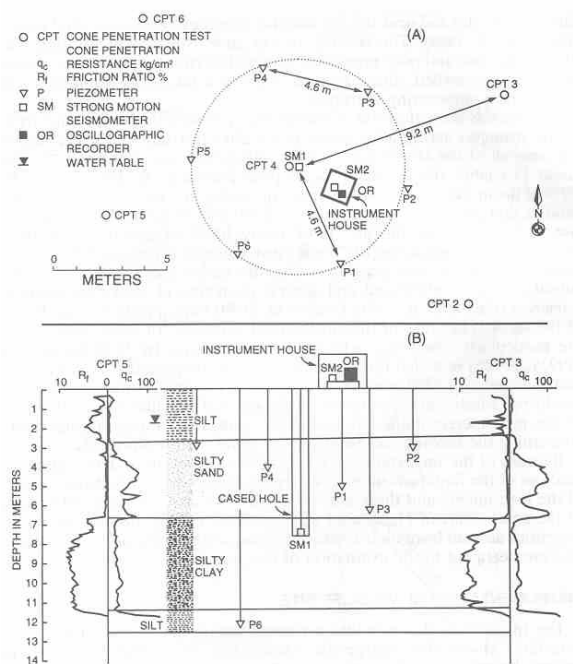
Site plan (a) and cross section (b) showing sediment layers and instrument locations at WLA (after Bennett et al., 1984)
